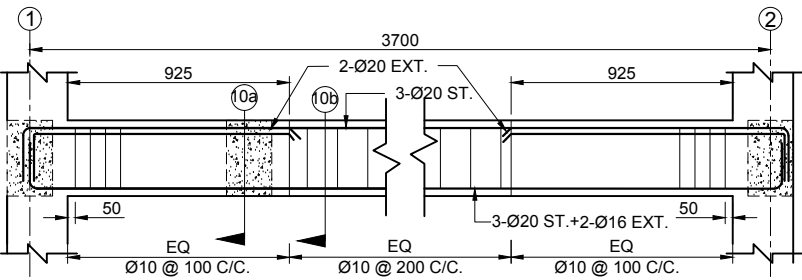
DETAILS OF FIRST FLOOR AND ABOVE BEAM
